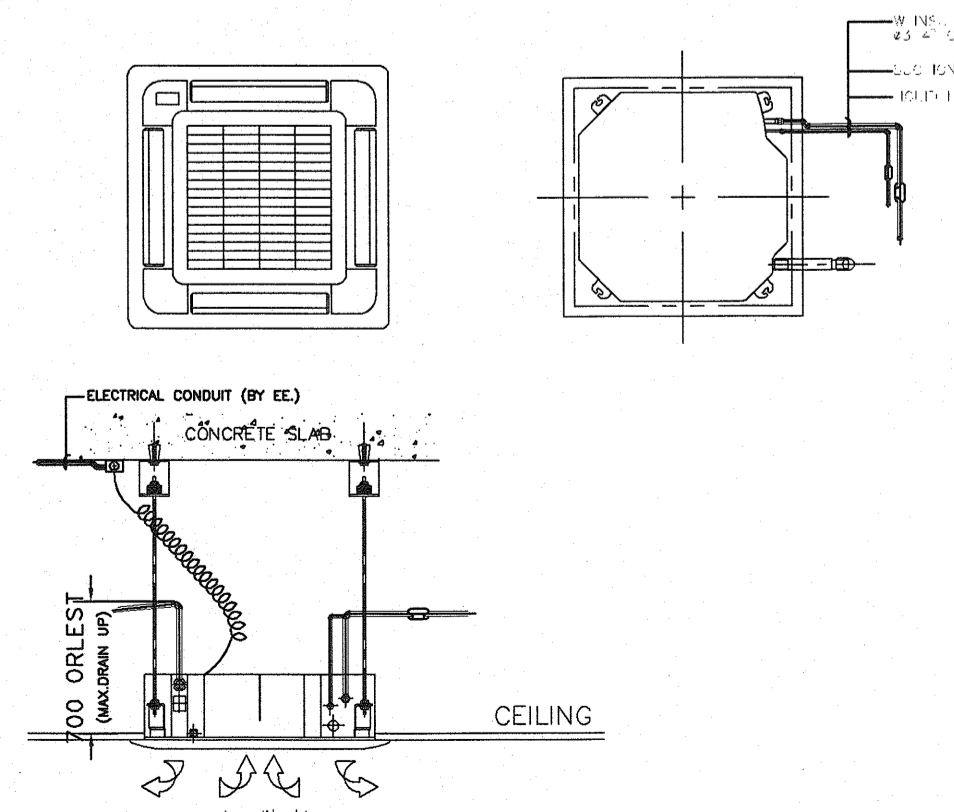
DETAIL CEILING MOUNTED DUCT TYPE INSTALLATION
